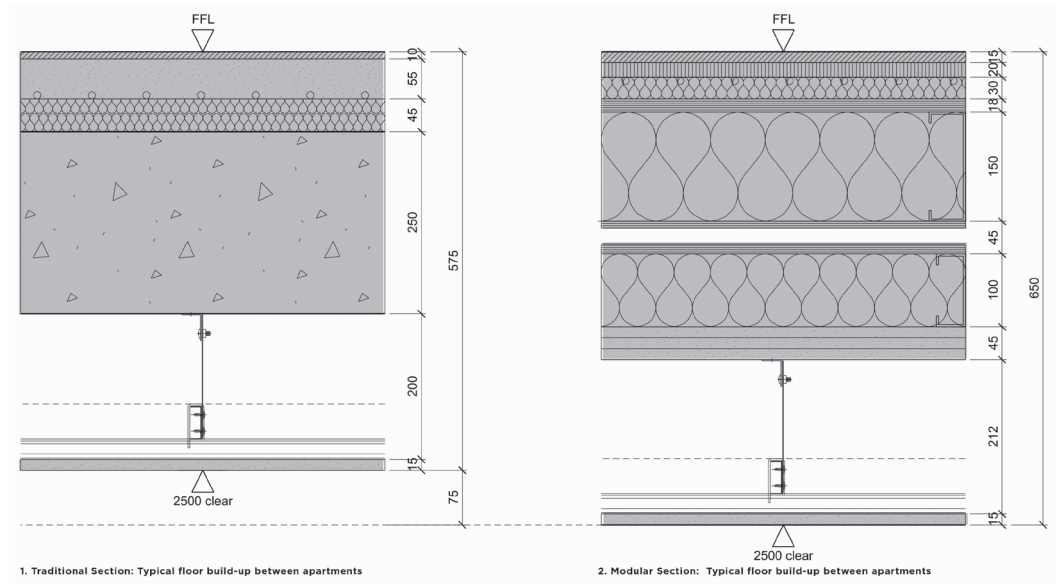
Comparative floor/ceiling constructions (courtesy Sheppard Robson)
